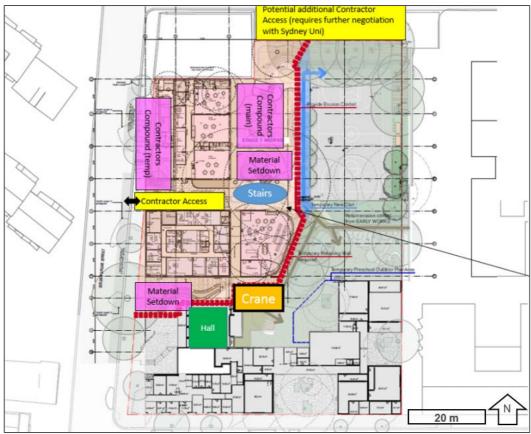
| Stage 1 Construction Plan (Source: Applicant's EIS 2020)
